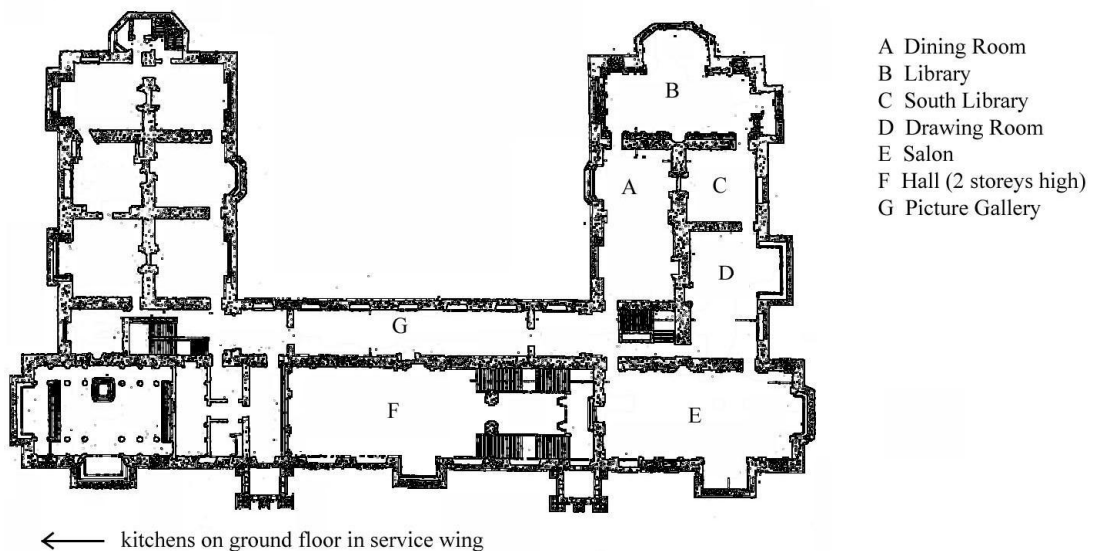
Audley End: first floor plan (Richard, Lord Braybrooke, 1836)
